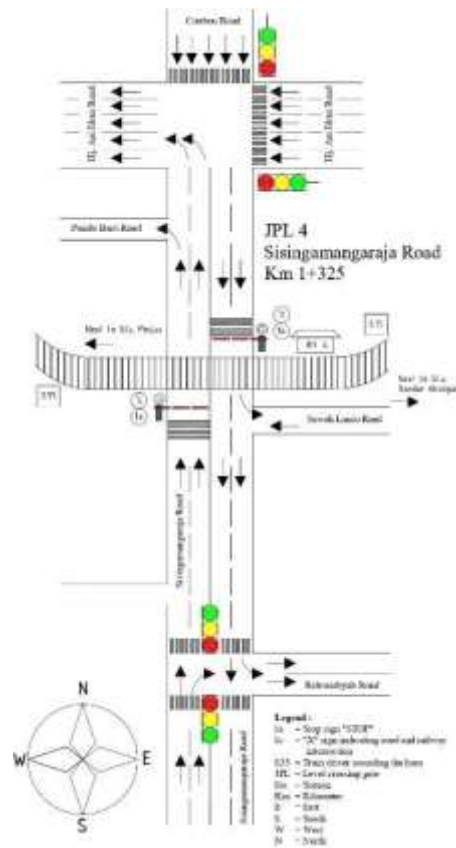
Layout of KM 1+325 crossing (Medan – Tanjung Balai line)
